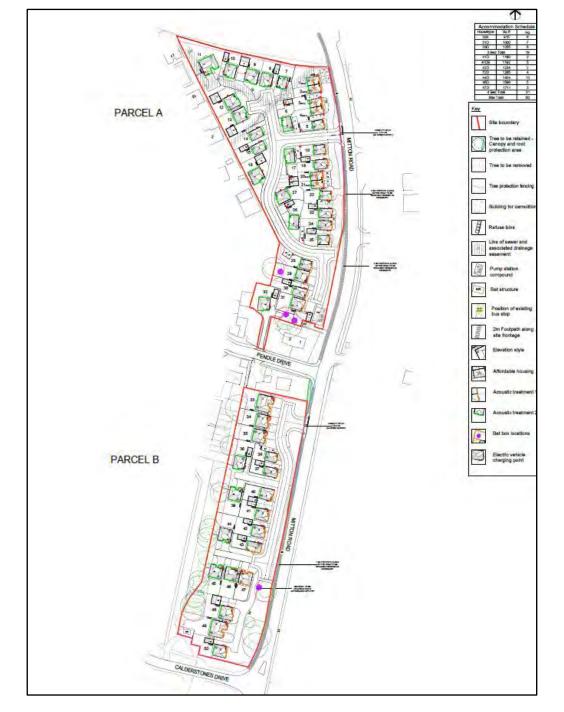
Prospect approved layout (Ref: MR/W-SJS-PLO1 Rev F)
